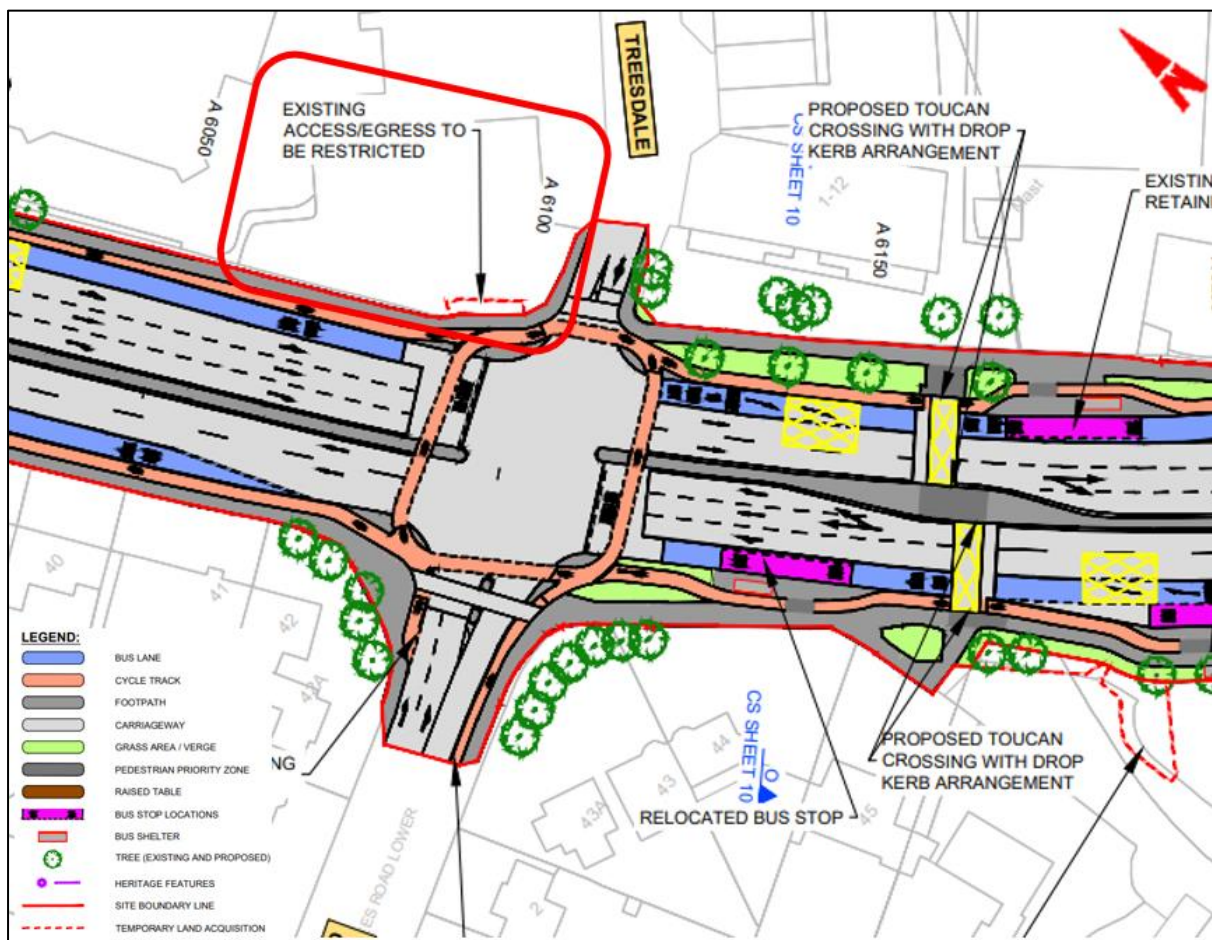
Extract from General Arrangement Drawing at Stillorgan Road (Sheet 19)
